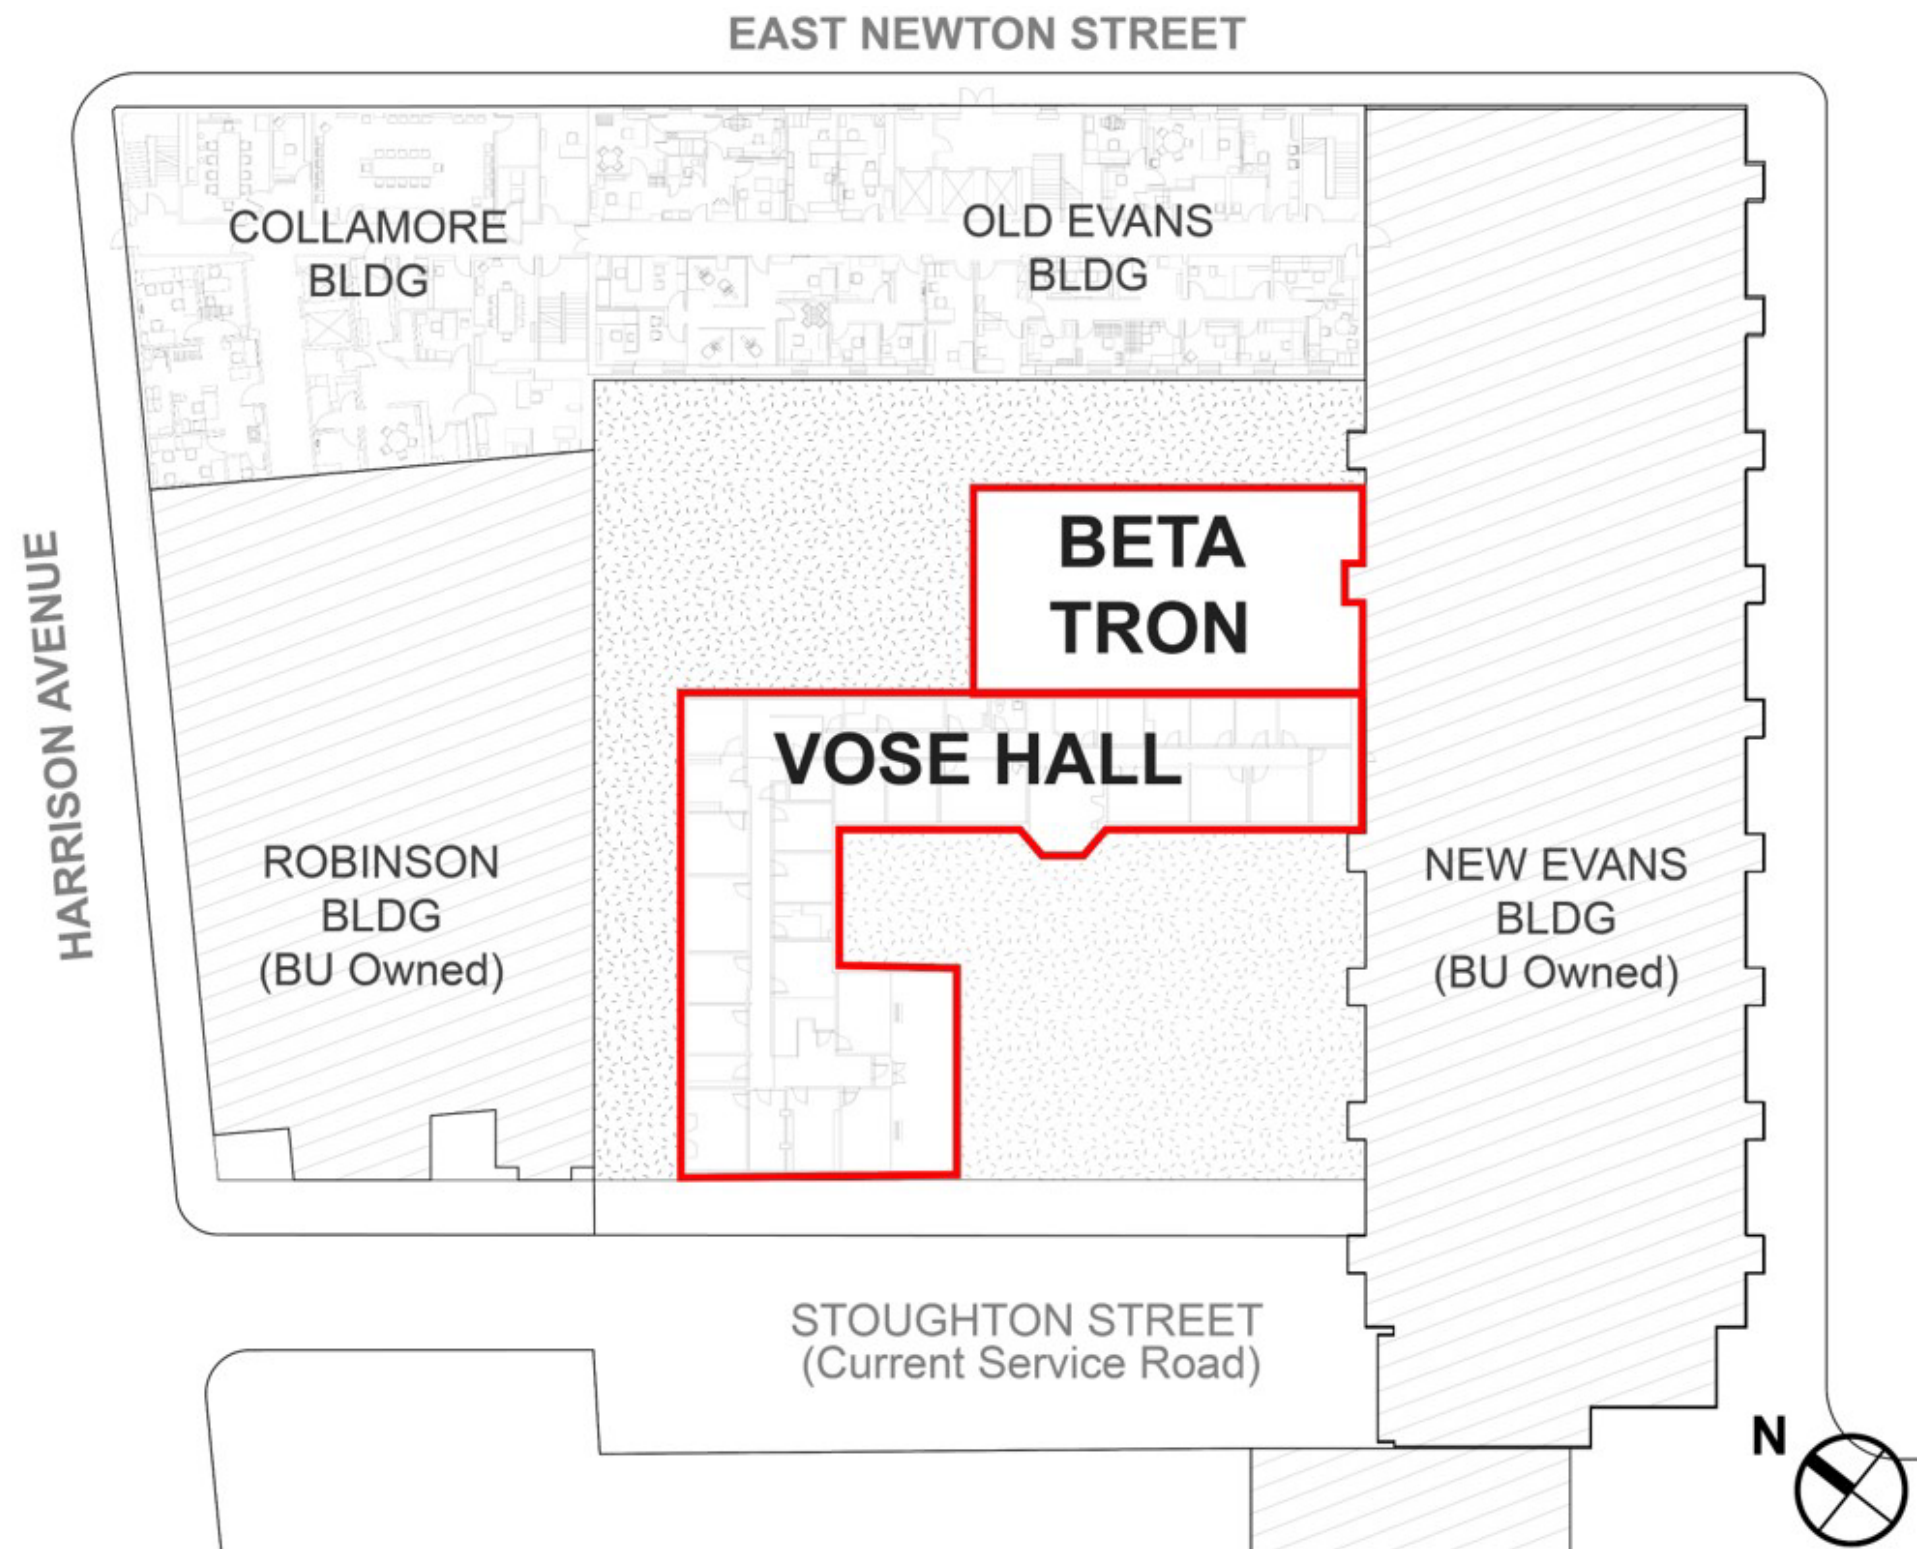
10 Stoughton Street & Collamore/Old Evans Proposed Site Plan
